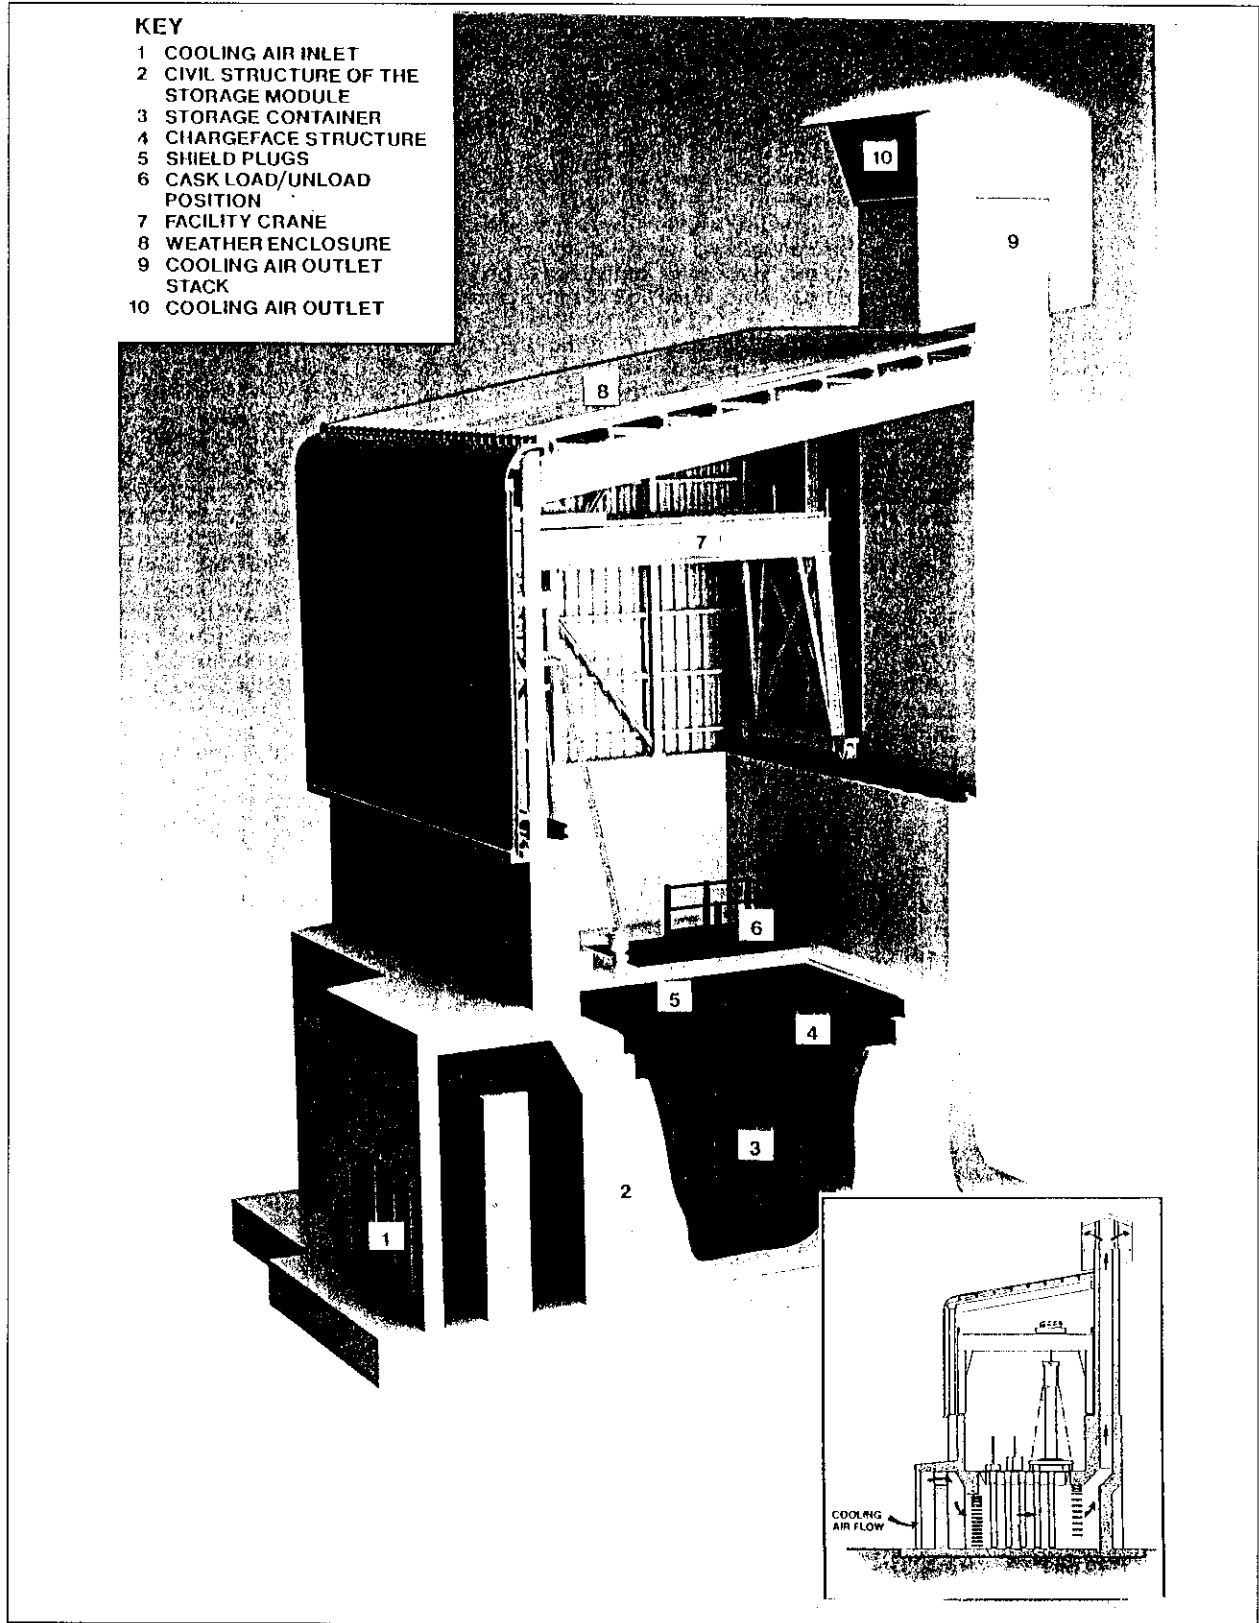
Illustration of a Typical Modular Dry Vault Storage Facility
